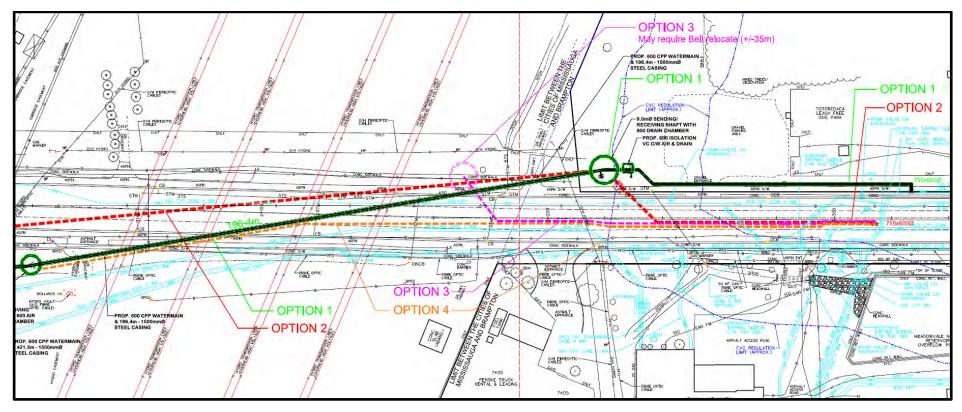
Edgeware Road to Meadowvale North Pumping Station Tunneling Section 3 with Open-Cut to Existing Watermain
